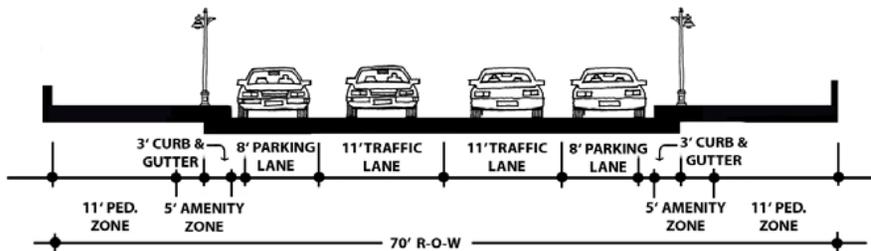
COMMERCE STREET ARTS DISTRICT STREET SECTIONS (WITHOUT STREETScape)
